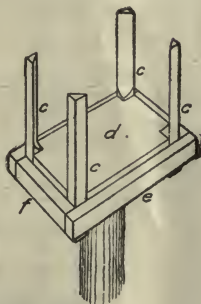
Floor and posts added to foundation shown in figure 13.
